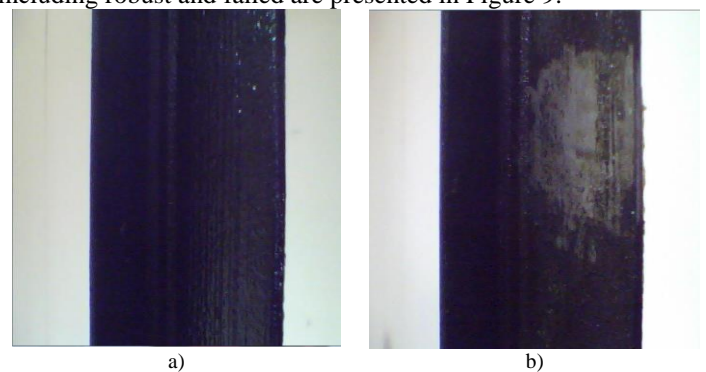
Sample rail surface image a) Robust rail surface image b) Failed rail surface image
